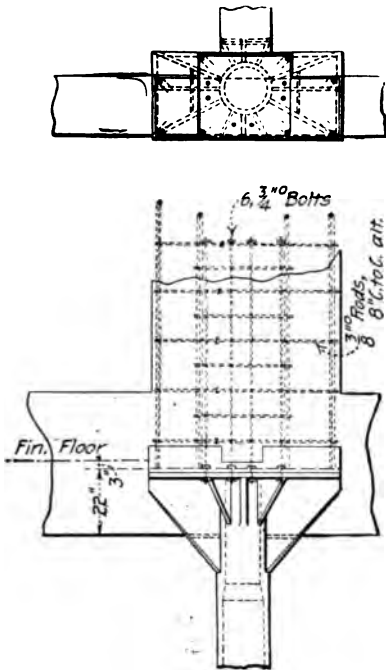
Method of Supporting Concrete Column on a Cast-Iron Column.
